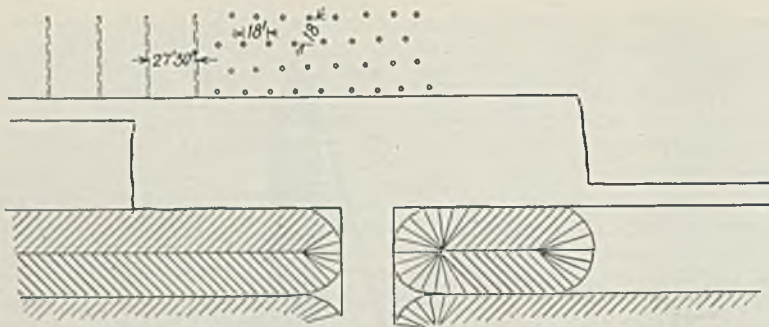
Diagrammatic plan of stripping and drilling at Delta
